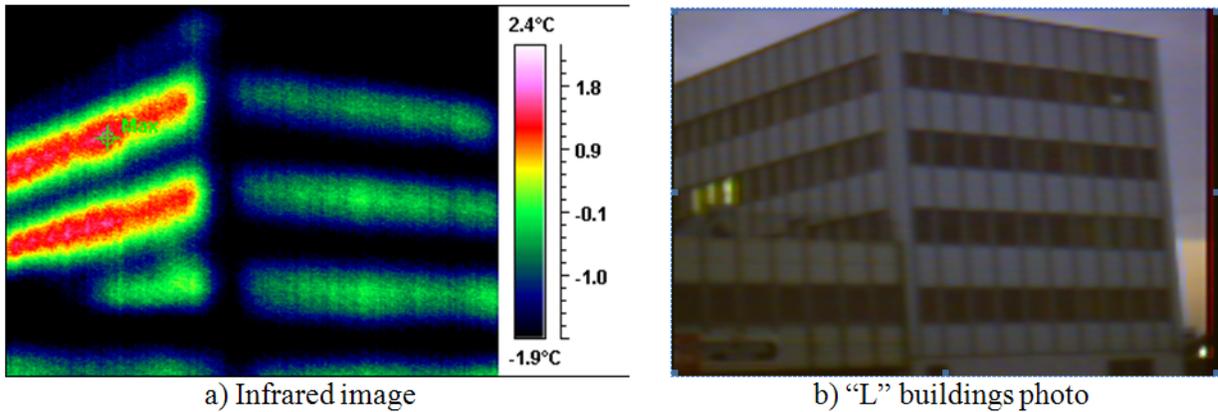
IR image and photo of the “L” buildings walls (after renovation)
